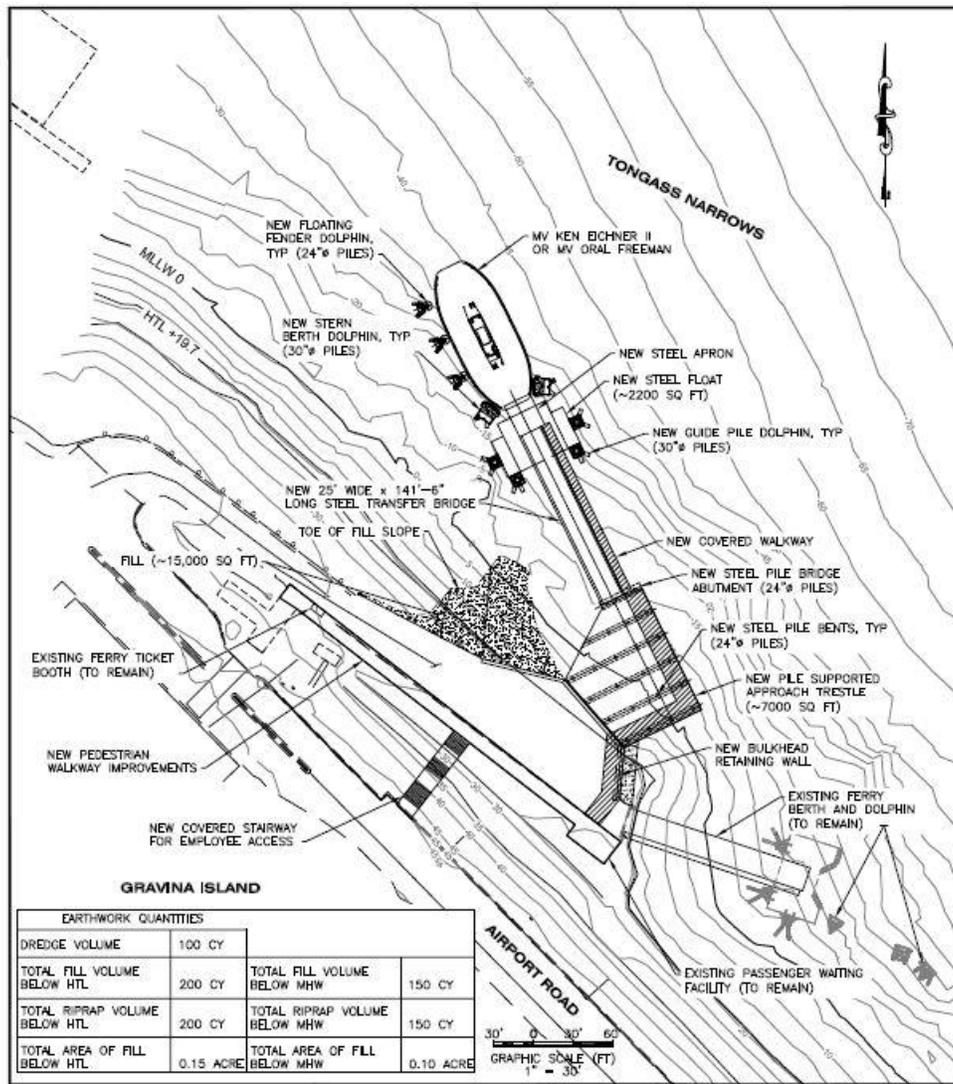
Site plan for the proposed new Gravina Island Airport Shuttle Ferry Berth (HDR 2023).
